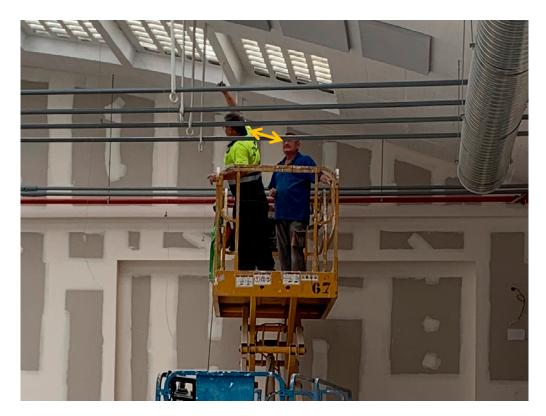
Workers finishing hydraulic pump placement in civil work for water conduction. The work had to be performed in pairs without a safe distance (author's photograph).
